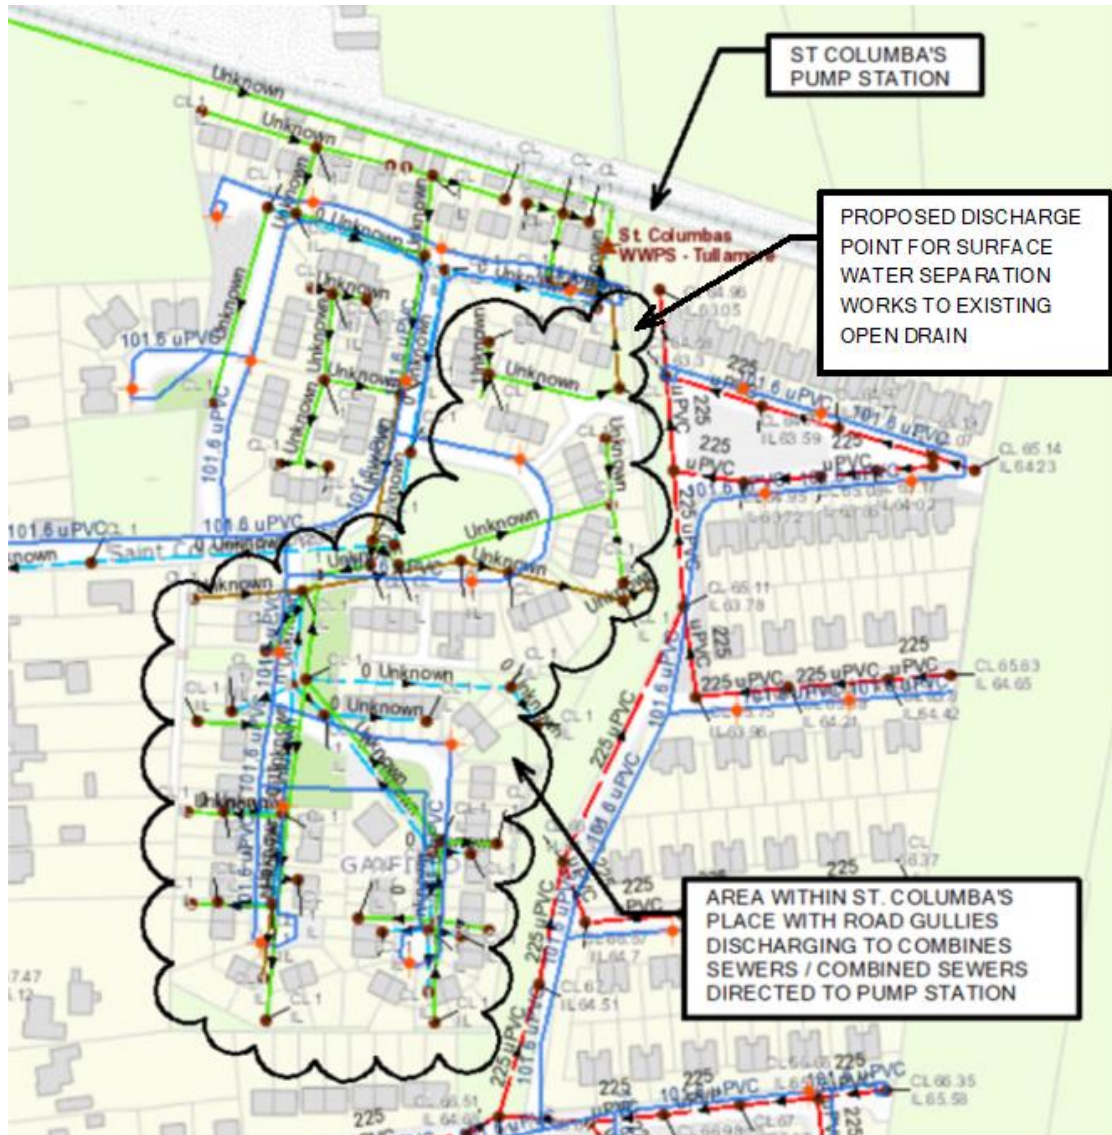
Extract from Irish Water Network Plan – St Columba's Park
